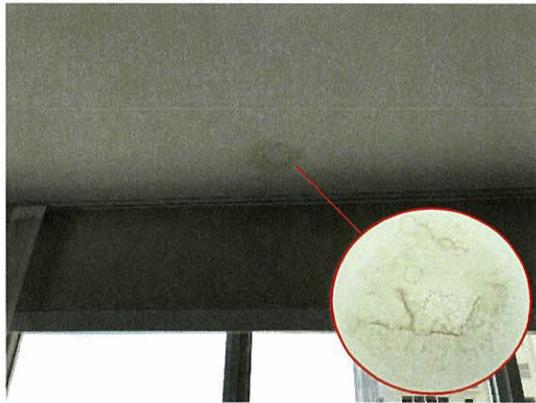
Evidence of water intrusion and damage at ceiling from exterior opening created by the wind buffeting due to Irma's wind pressures. See photo 5.2.2.6.
